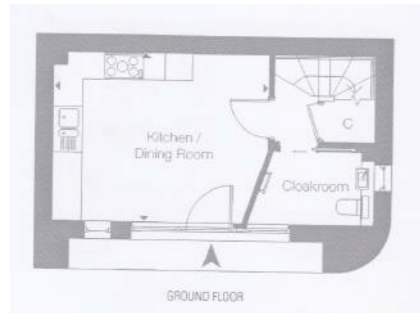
Ground floor room, Well Lit Living room over looking adjacent street
